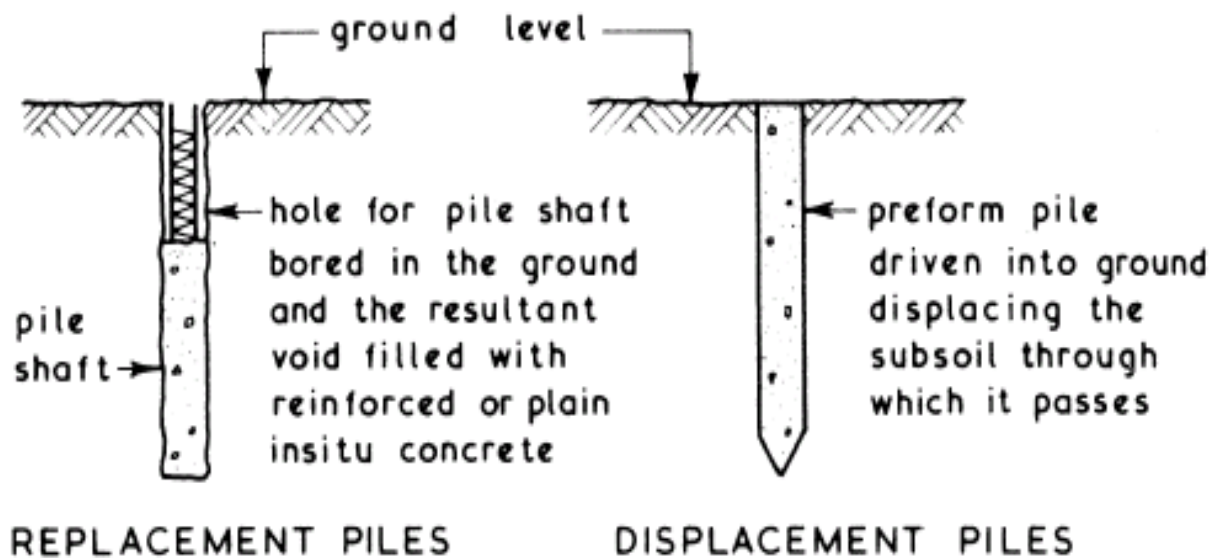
Pile Foundations -Classified based on method of construction
